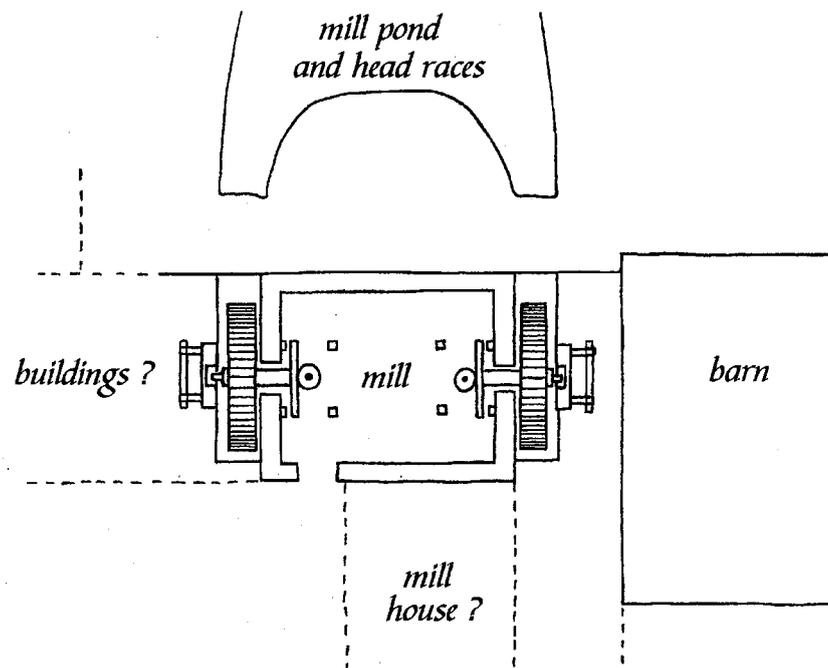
Possible general arrangement of mill buildings and machinery before reconstruction in 1851/2.
